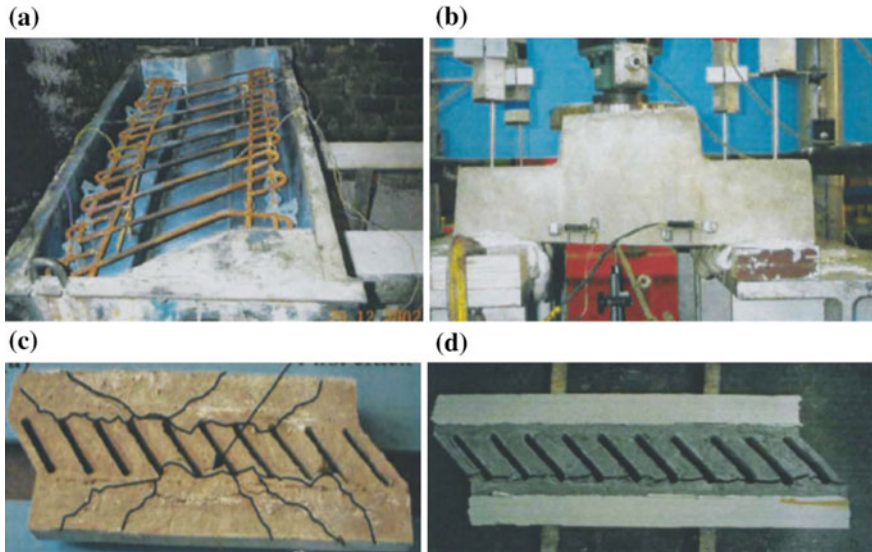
Concrete slabs for drainage systems: a conventional steel reinforcement used in this type of slabs, b test setup, c crack pattern in the slab conventionally reinforced and d crack pattern of the RSFRC slabs (Tlemat 2004)
